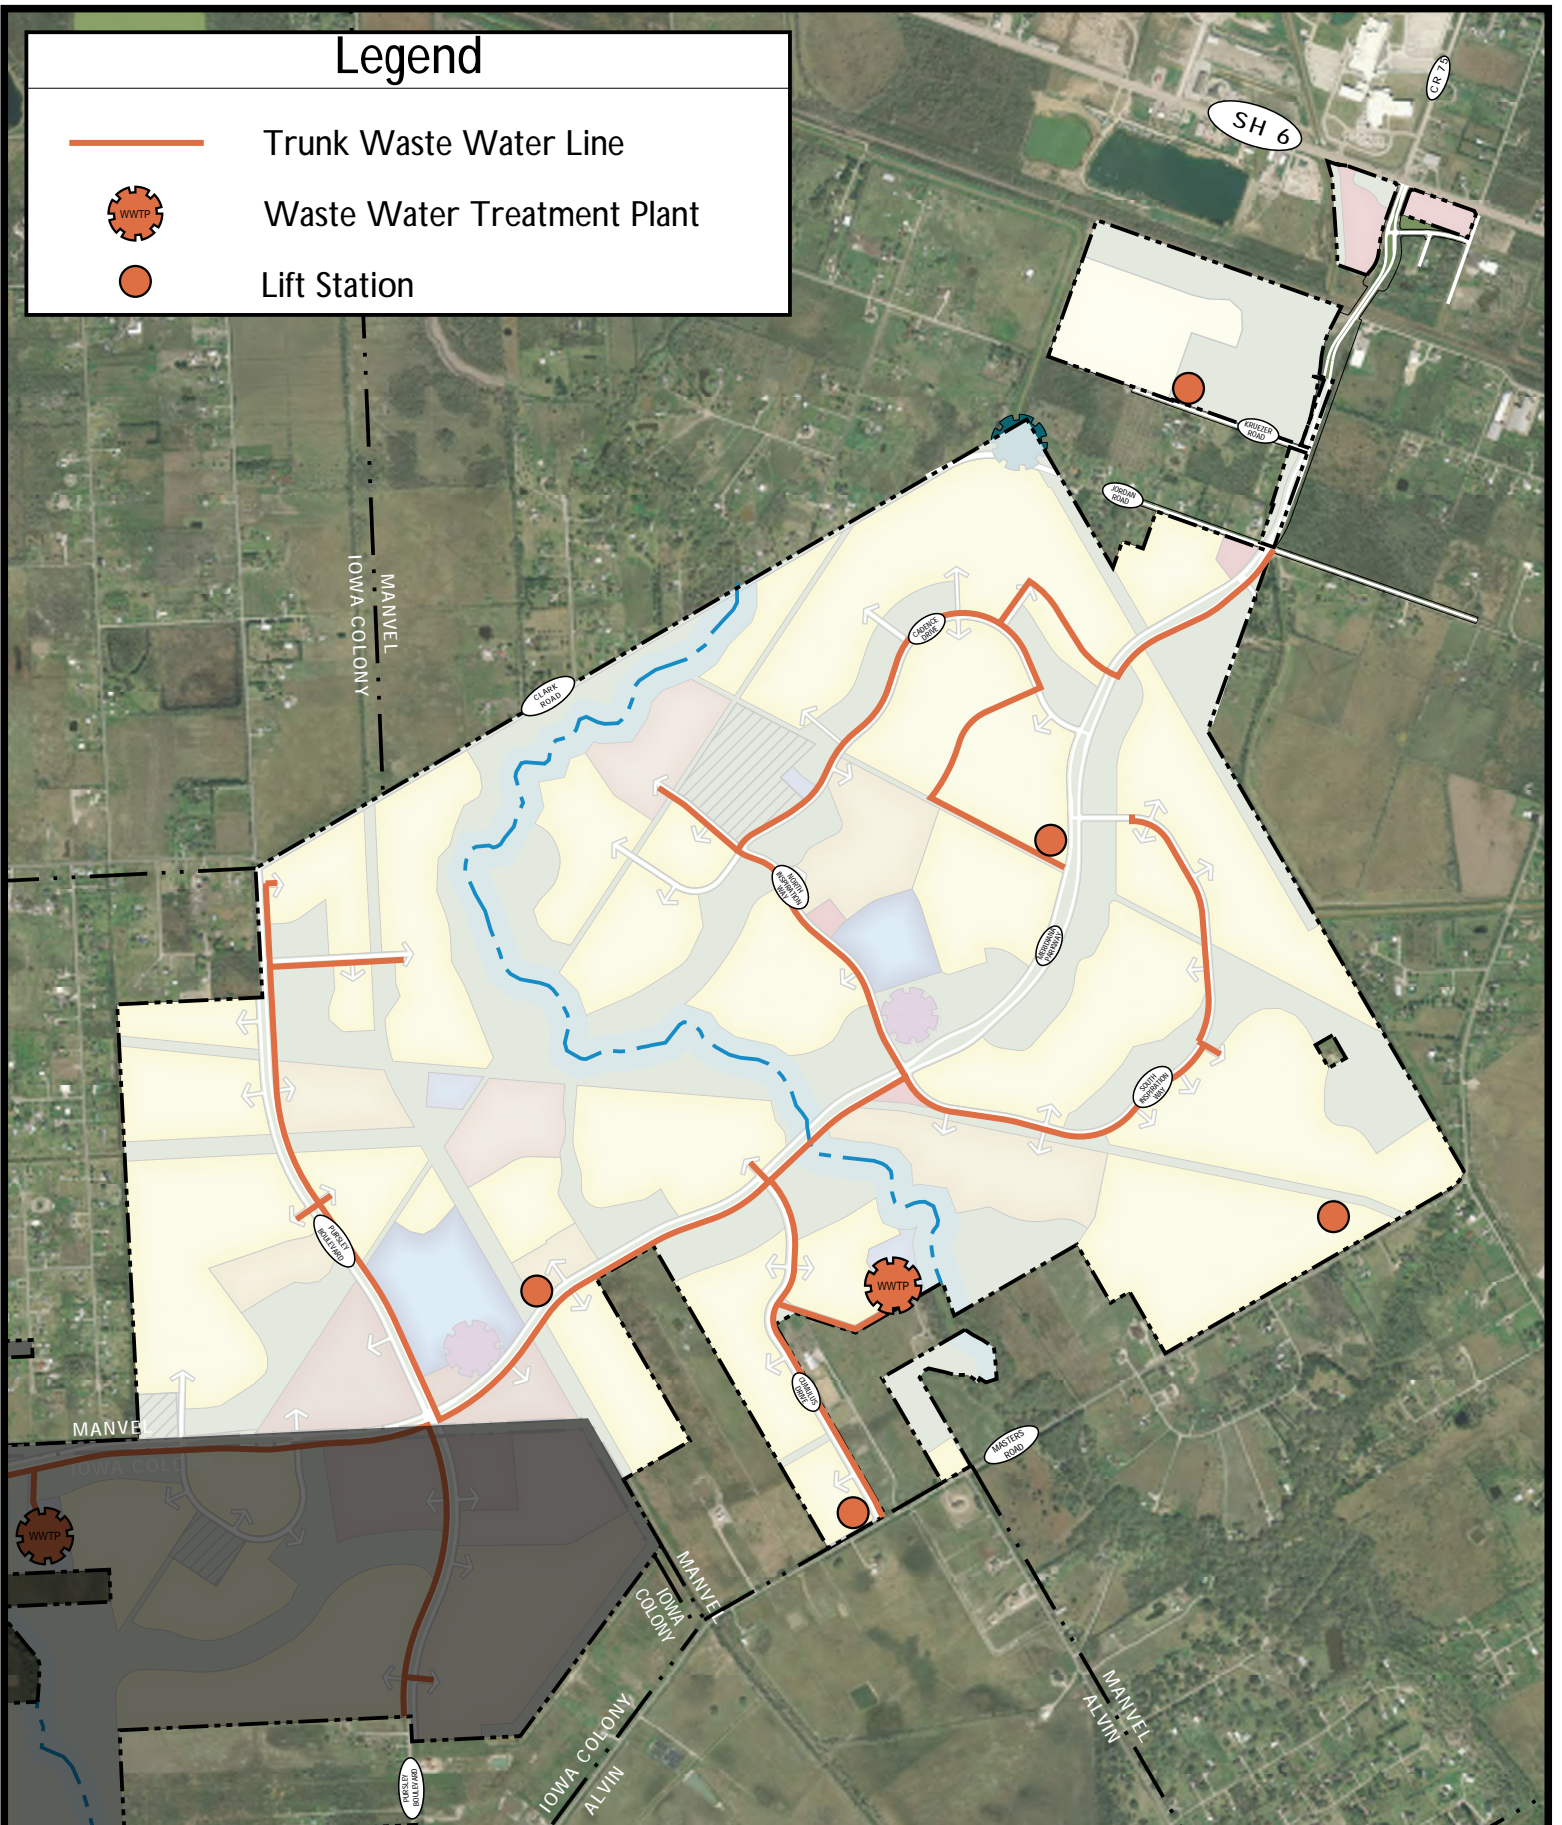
Sanitary Sewer Collection & Treatment Plan - Manvel
